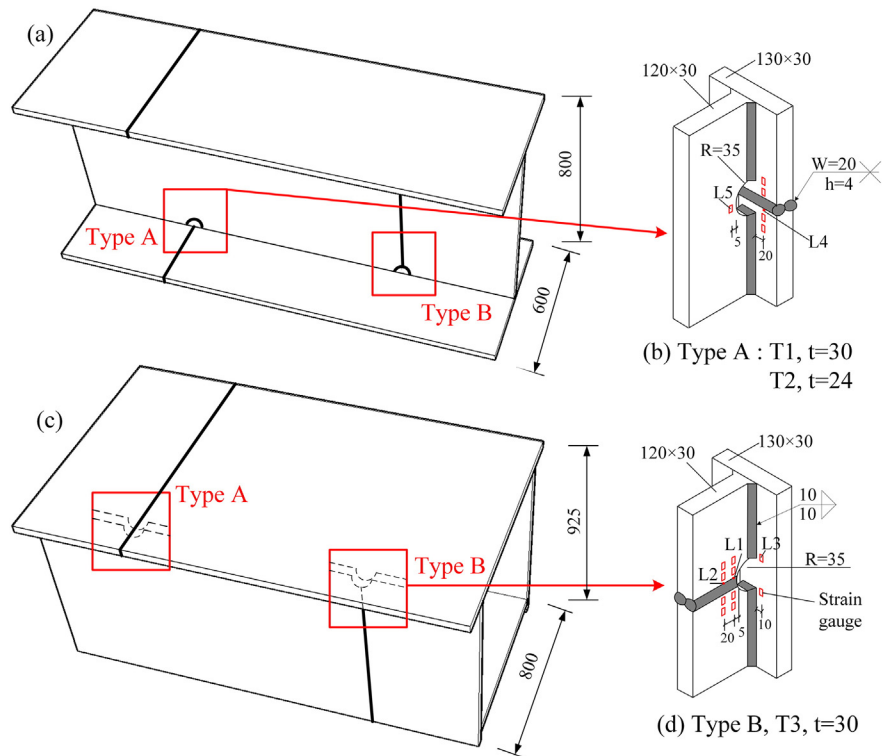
The geometry of specimens (mm), and the location of strain gauge.
